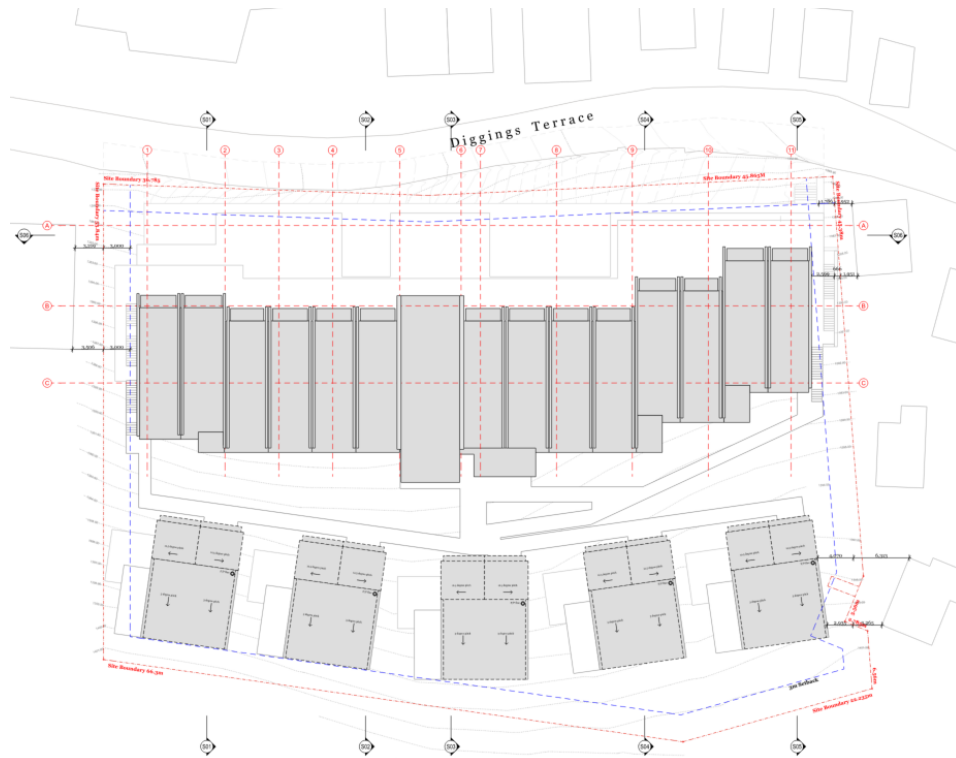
Roof plan of The Development courtesy of DKO Architecture.
